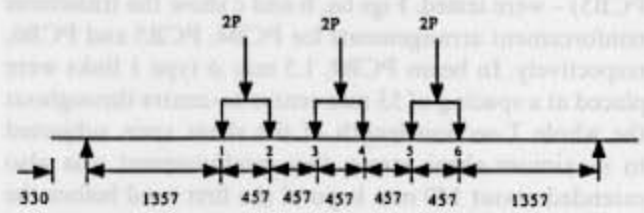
Six-point loading configuration (all dimensions are in mm).
